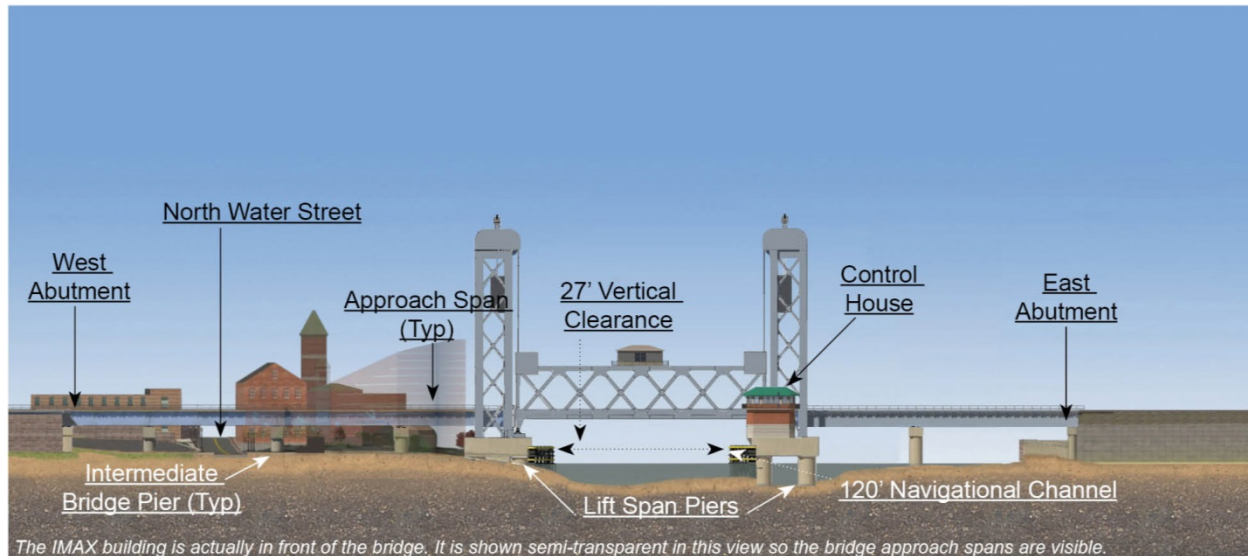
Elevation View of the Short Span Vertical Lift Bridge (Option 8A)
